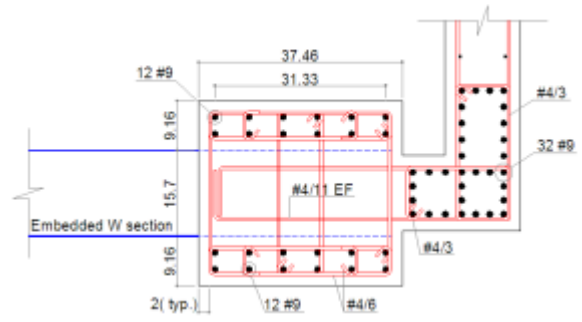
Section 5 reinforcement detail of CCW (stories 11-12)
